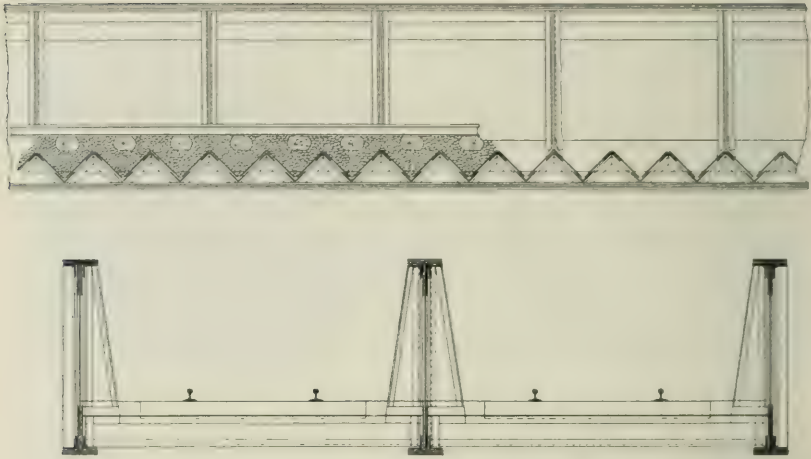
Longitudinal Section and Cross-Section of Bridge Floor.
